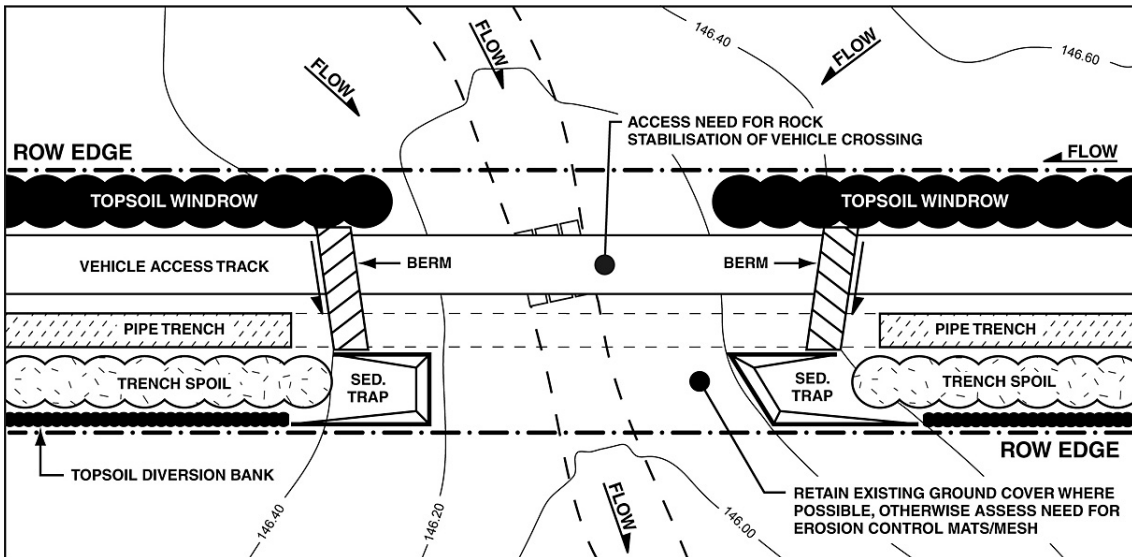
Possible layout of pipe crossing of waterway with pipe trench located down-slope of the vehicle crossing
